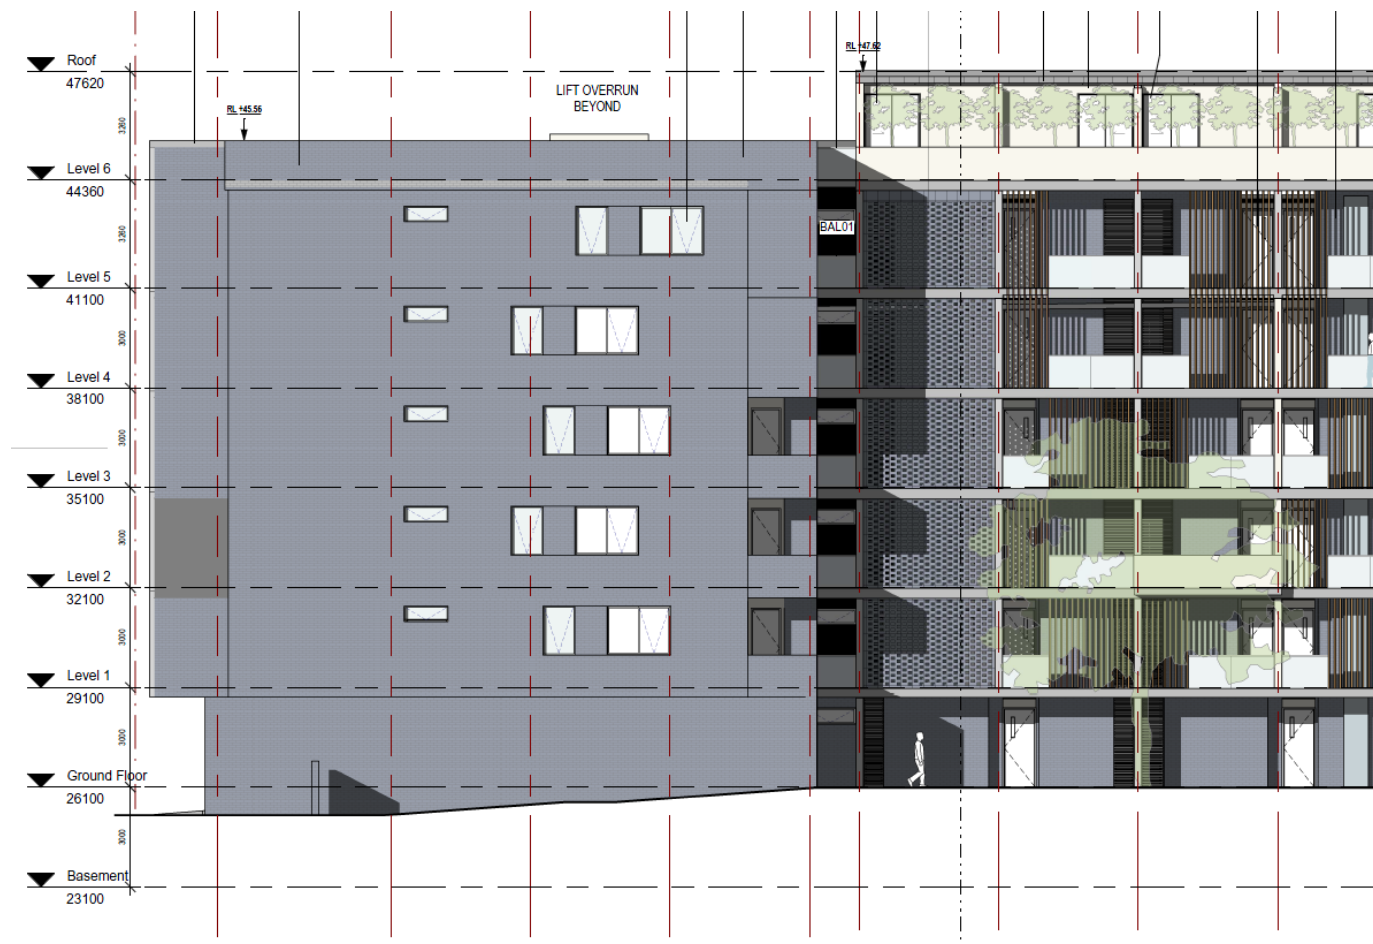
Excerpt from Drawing No. DA02-002- Southern Elevation
